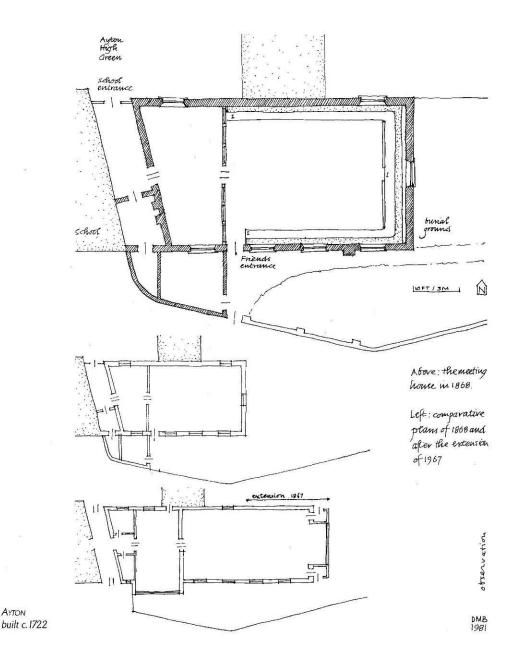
Plans showing the development of the meeting house to 1967, *Butler* 1999 vol.2 p.723. The plans do not show the latest (2001) changes at the west end of the building.
